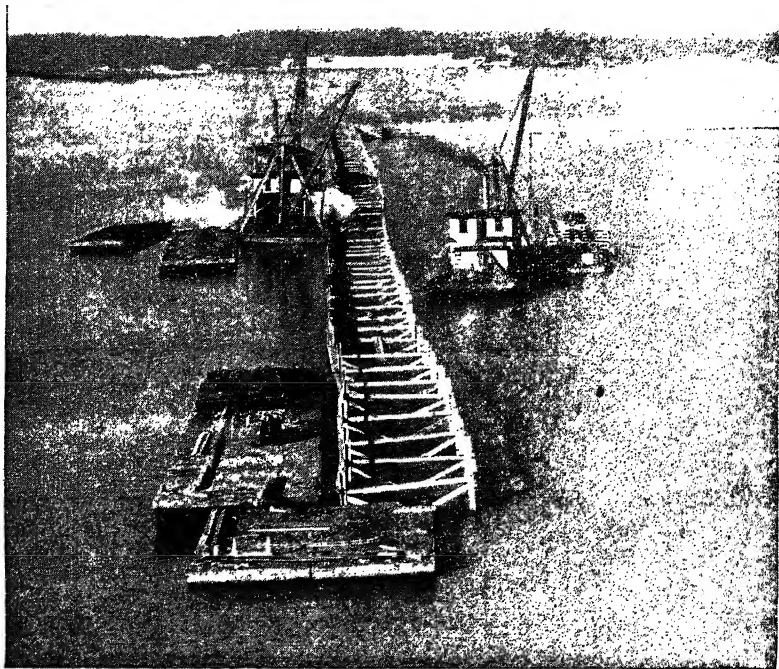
Ohio River type cofferdam at Wheeler Dam.
